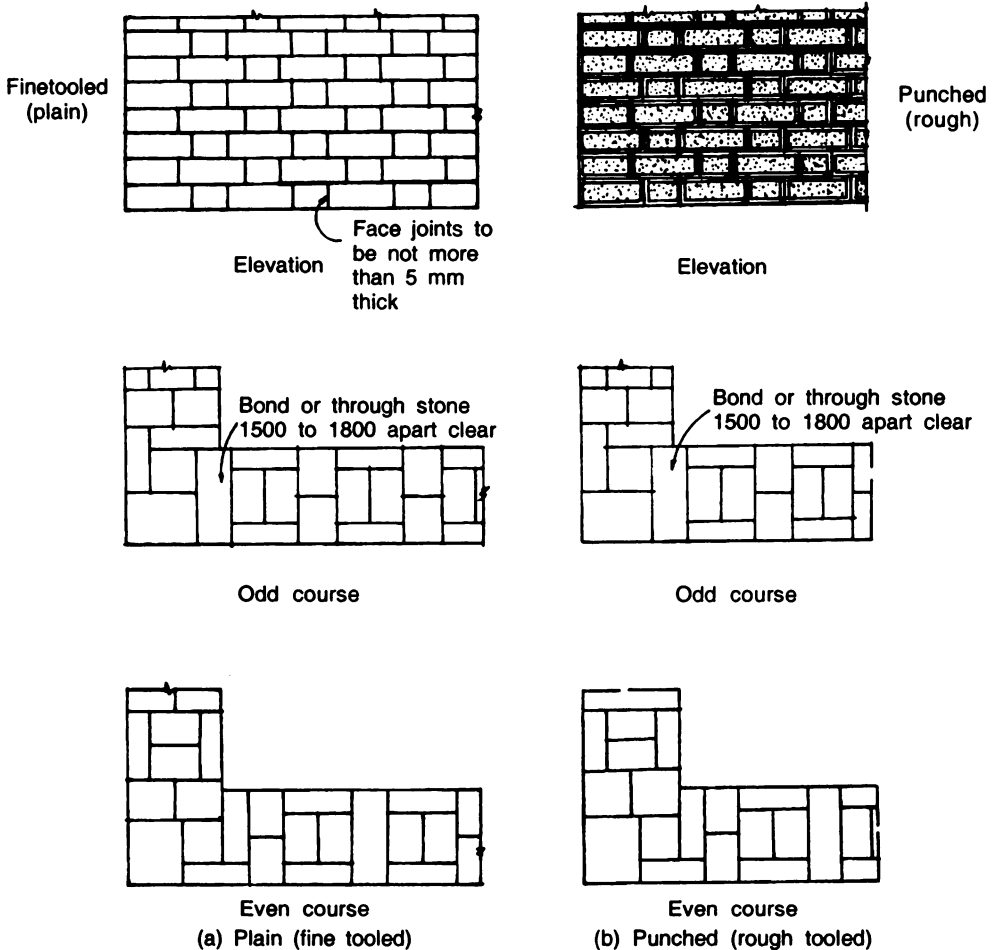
Ashlar stone masonry. (All dimensions in mm)
